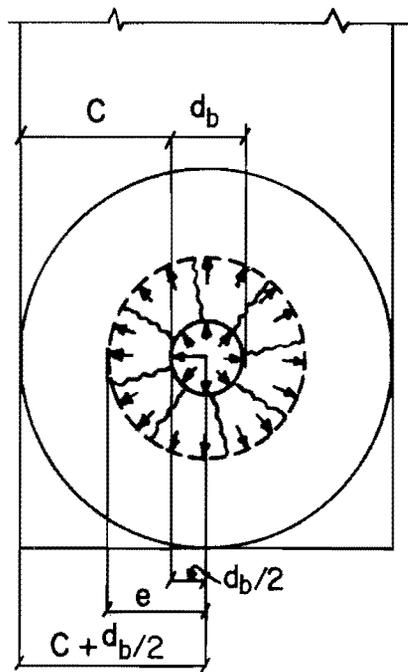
Internal cracks surrounding a deformed bar in concrete.
